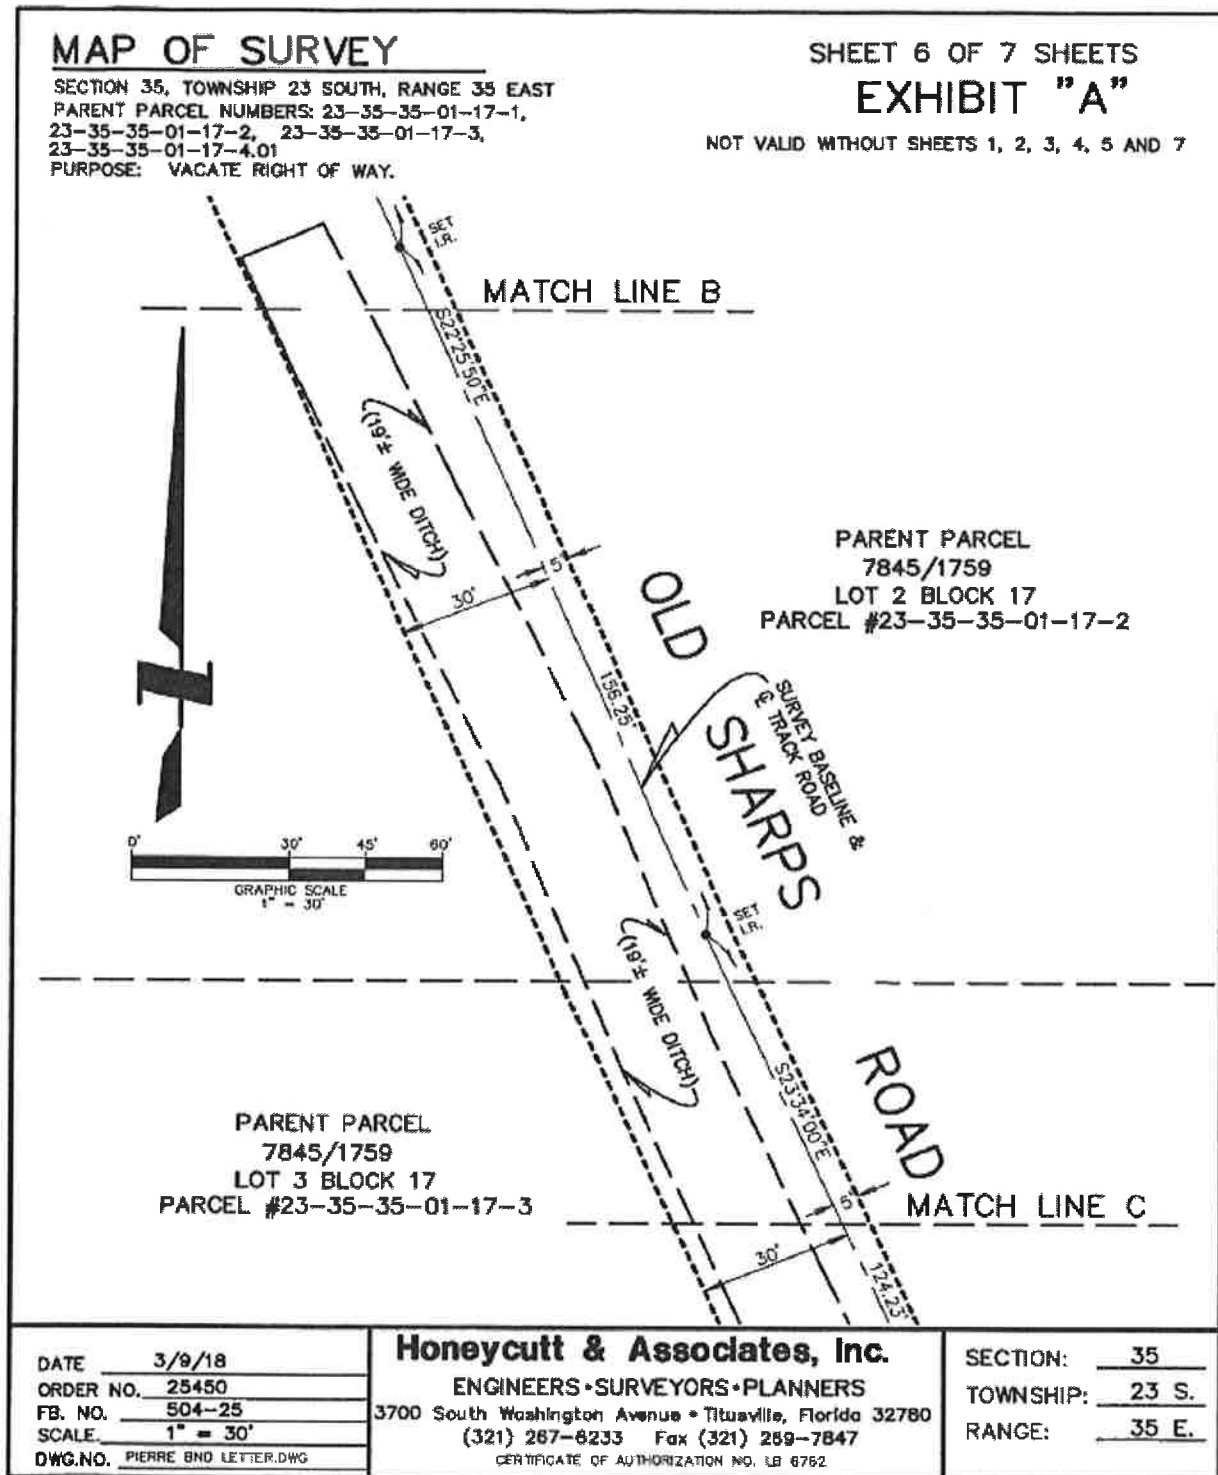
Copy of sketch sheet 6 of 7 of right-of-way Old Sharpes Road.
